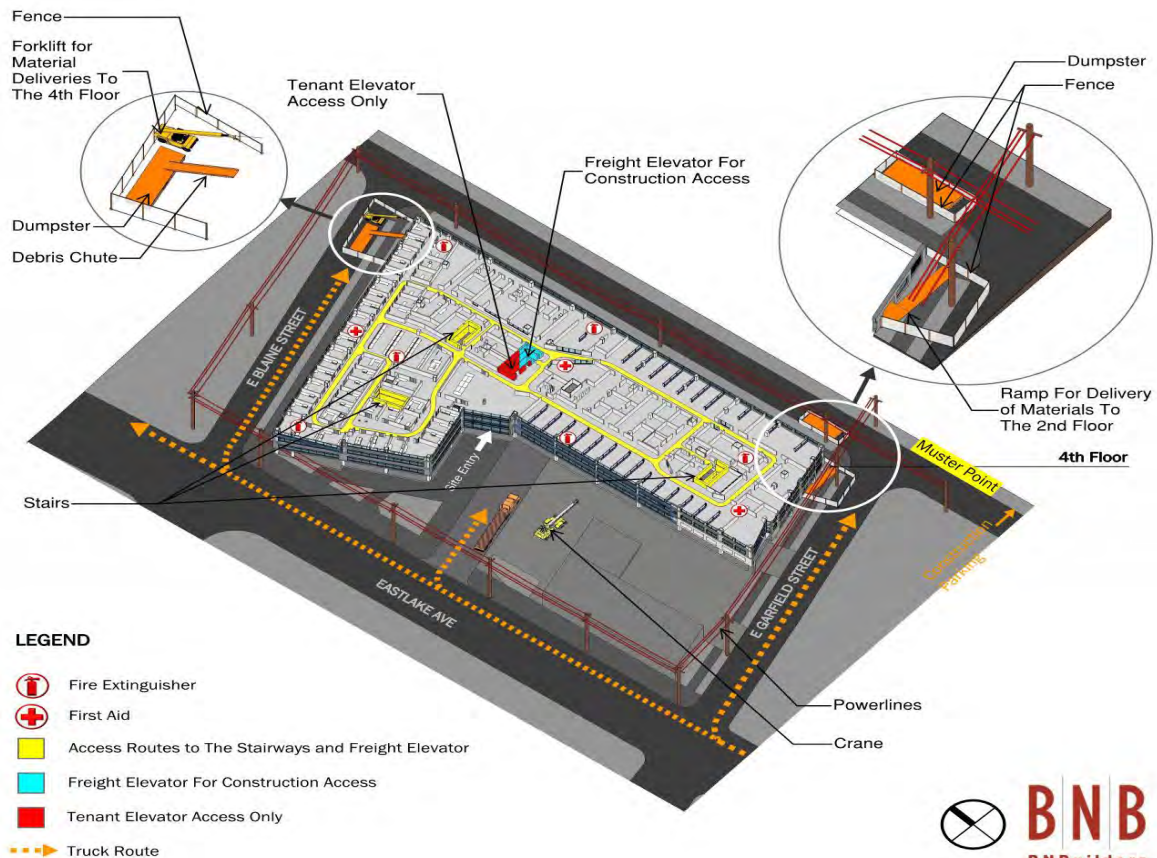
Example Construction Site Logistics Plan (Picture Courtesy BNBuilders)
